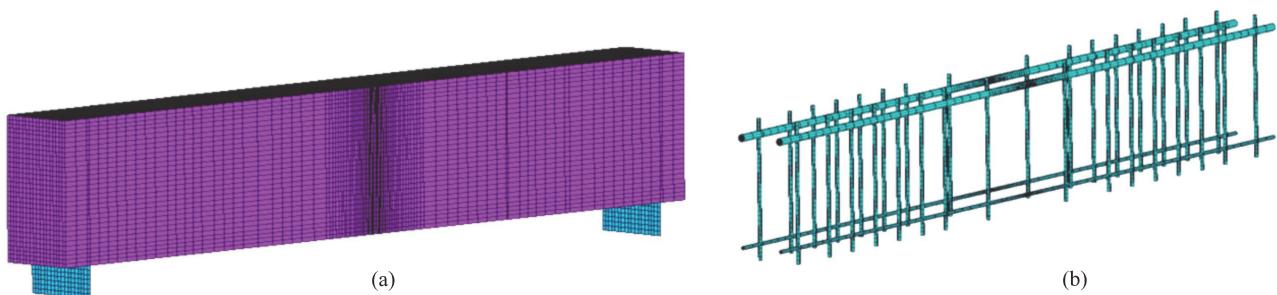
Finite-element mesh: concrete and supporting elements (a) and steel reinforcement (b).
